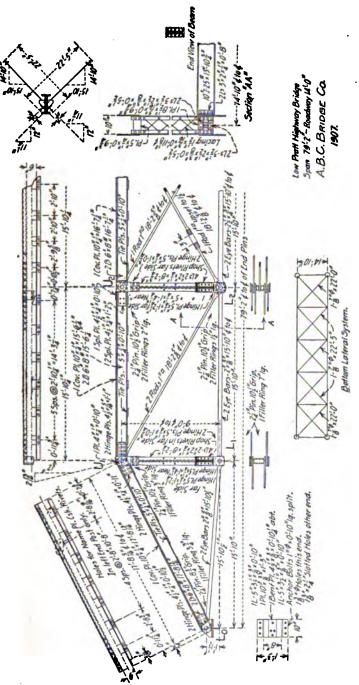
LOW FULL SLOPE "FISH-BELLIED" PRATT TRUSS HIGHWAY BRIDGE.
